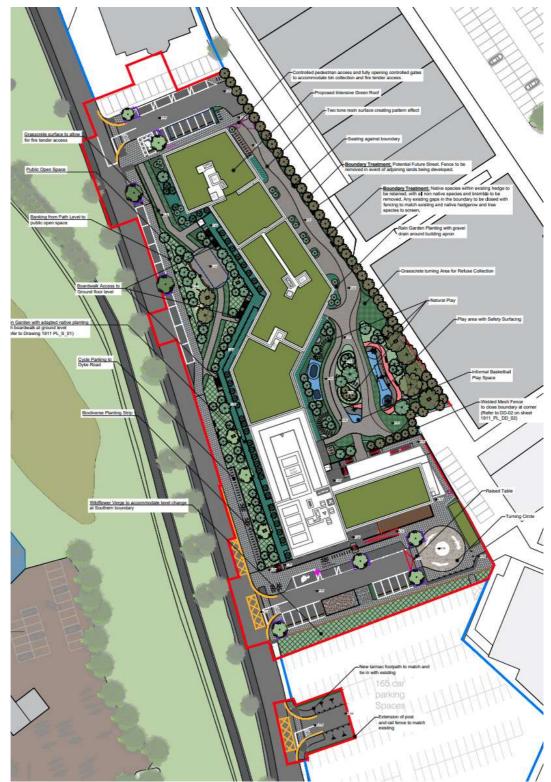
Proposed Site Layout Plan / Landscape Masterplan
